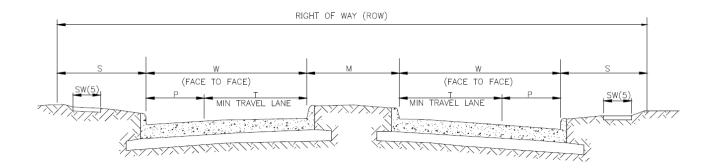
DIVIDED STREET TYPICAL CROSS SECTION
